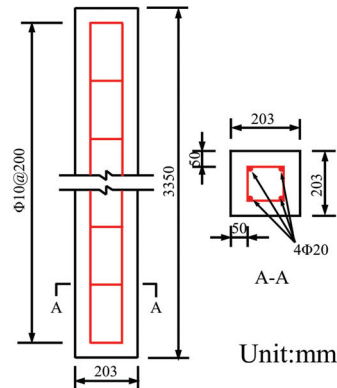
The evolution and cross-section and reinforcing details of NSC1.
